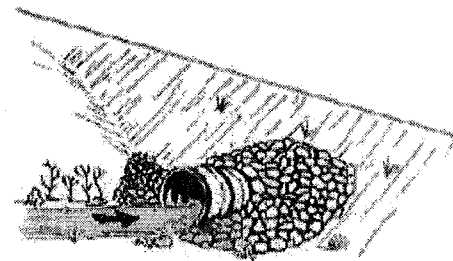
B. Riprap armor at culvert inlet (Keller and Sharat, 2003).
